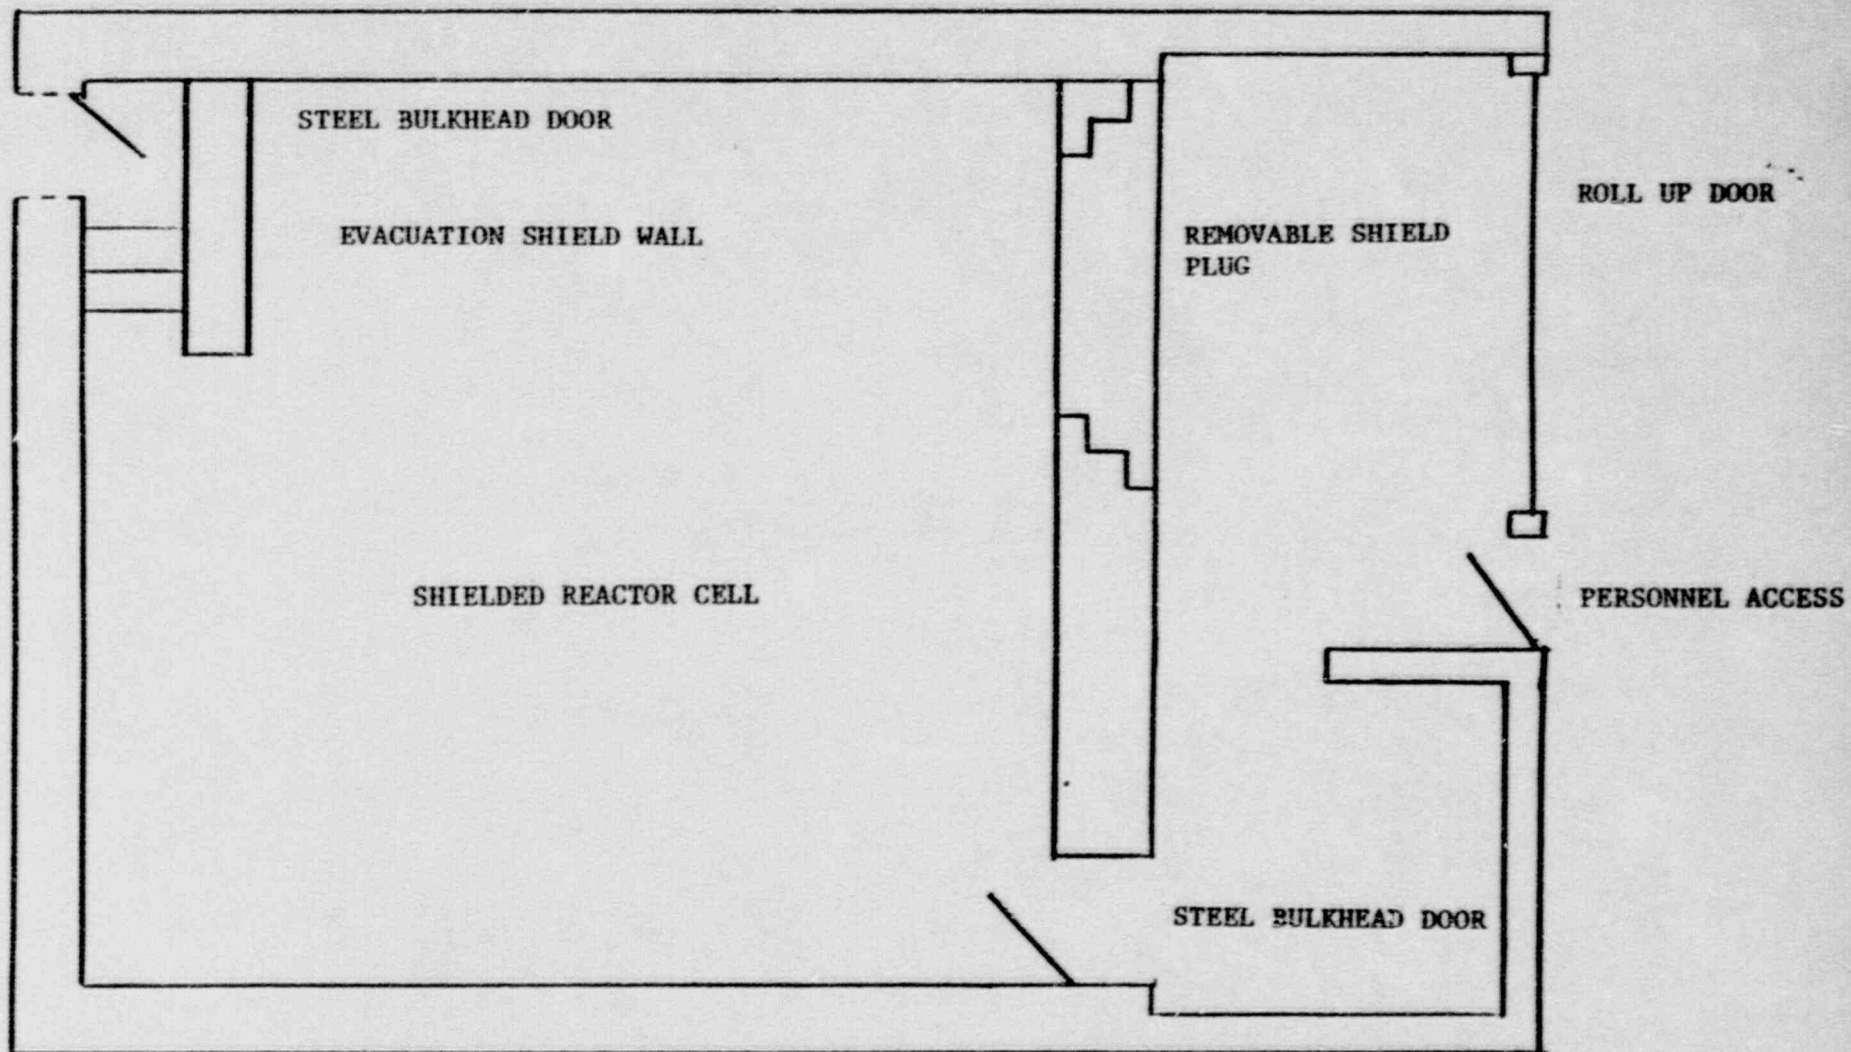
ECF REACTOR BUILDING PLAN VIEW
